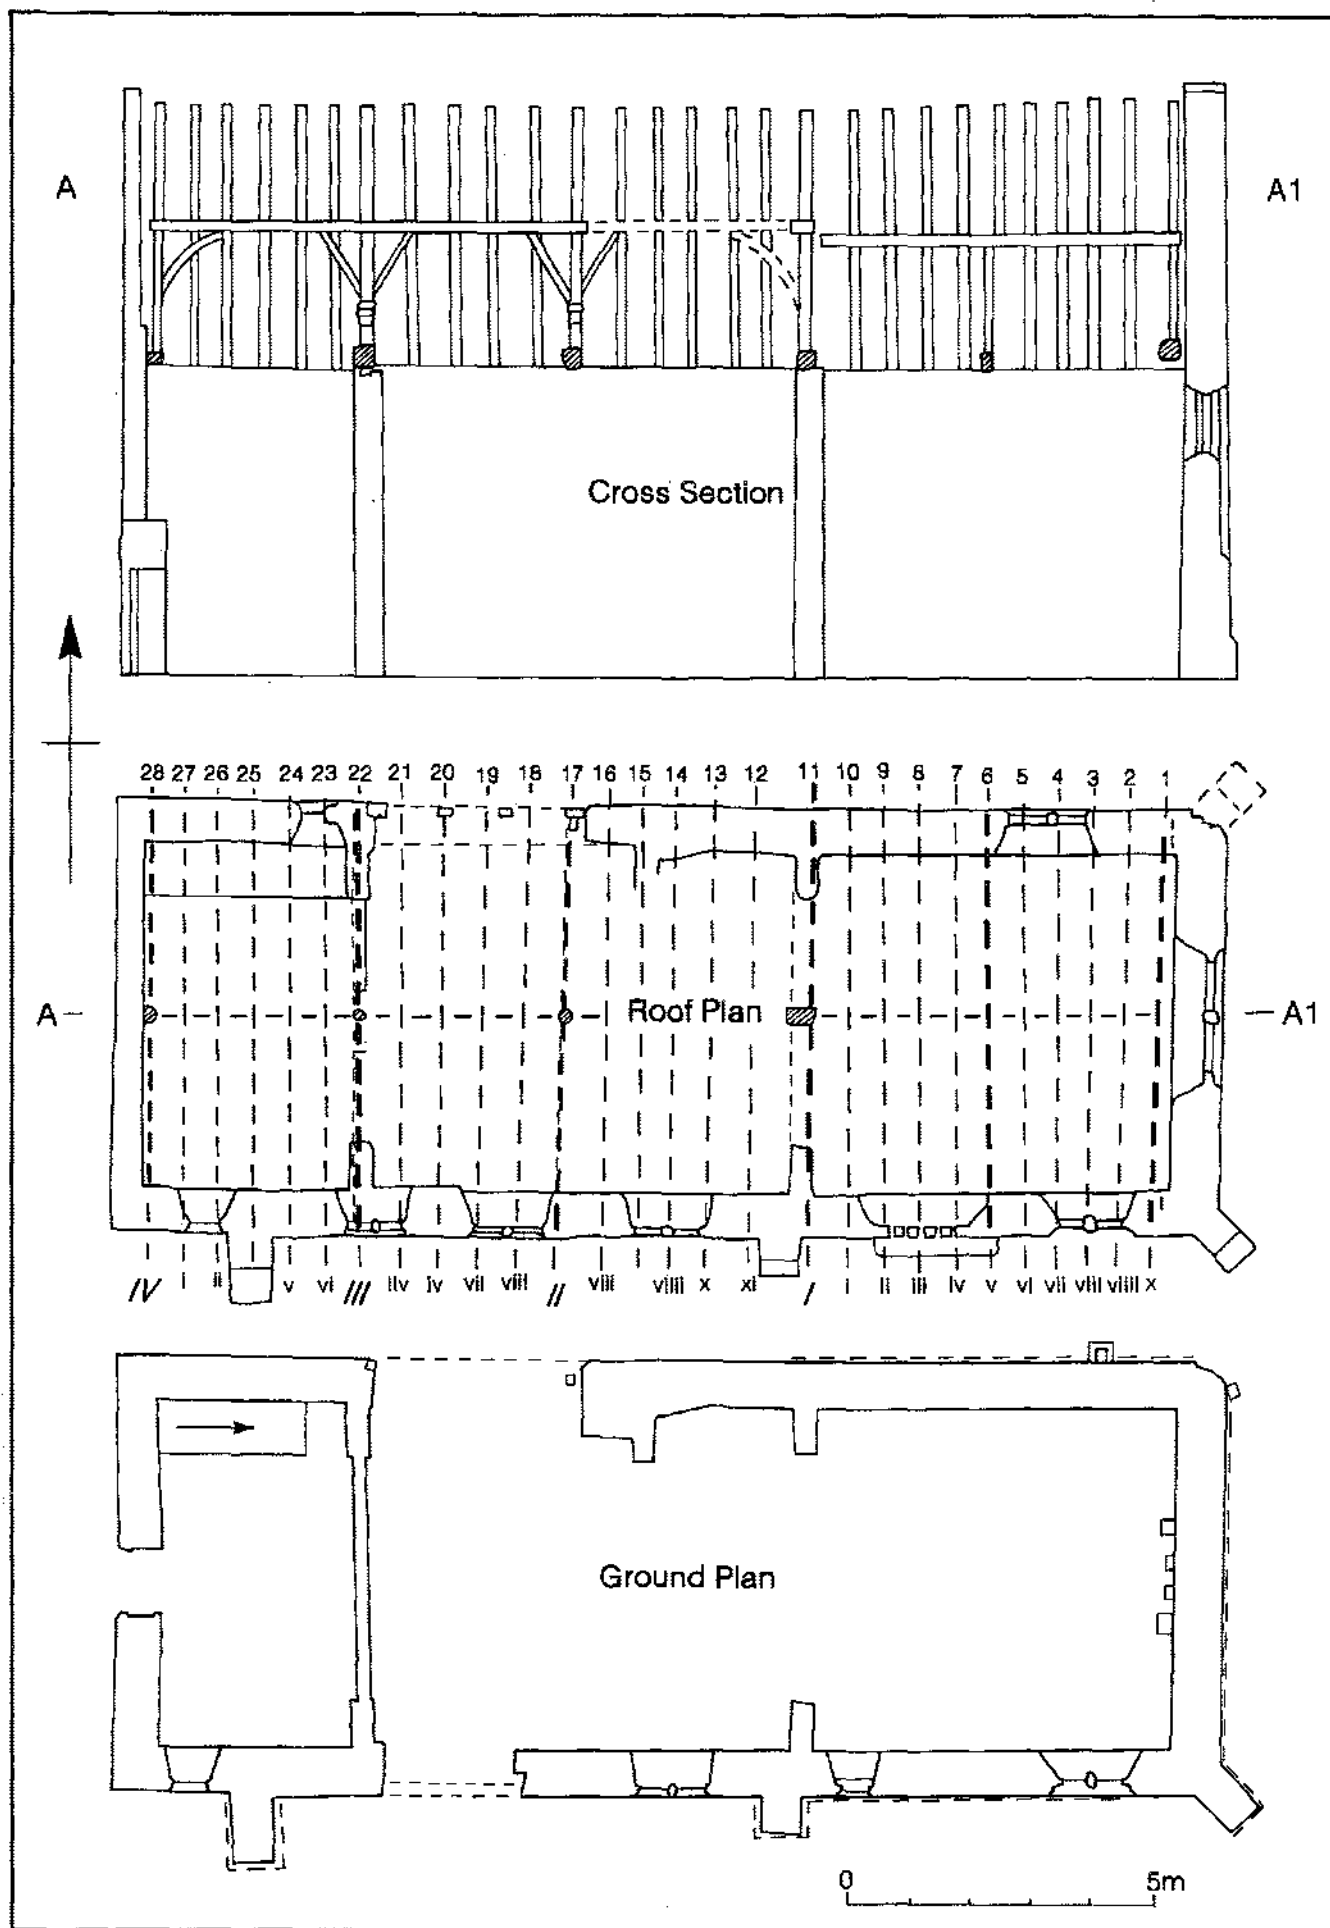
Structure 1, ground plan, roof plan and cross-section.
